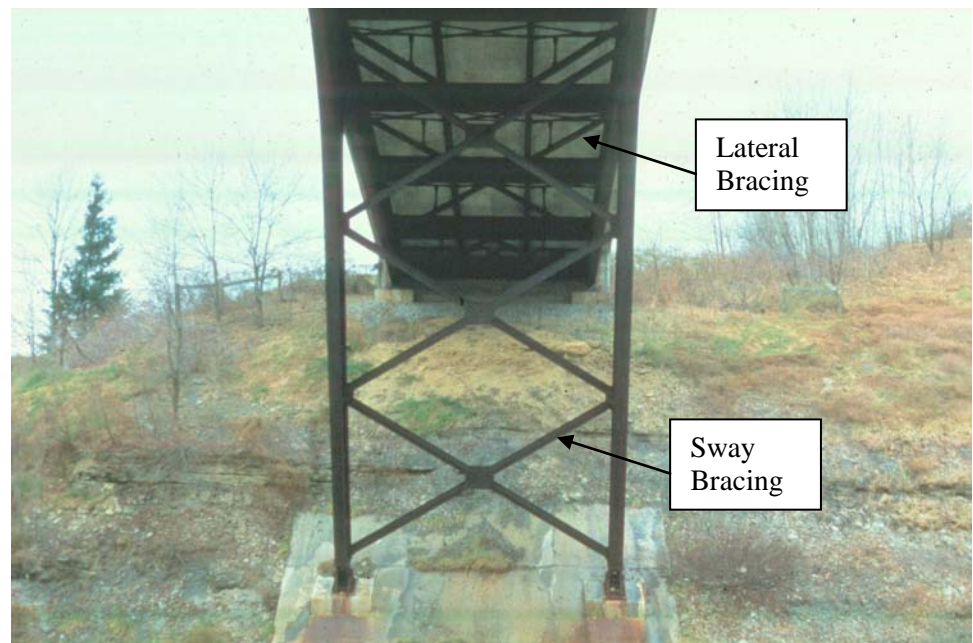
Lateral and Sway Bracing for the Frame Legs
